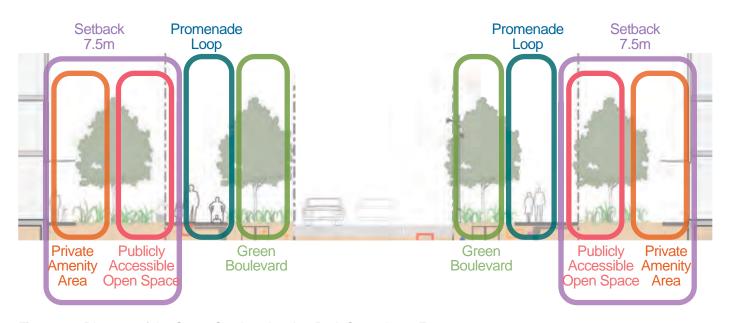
Diagram of the Street Section showing Park Street Loop Zones
